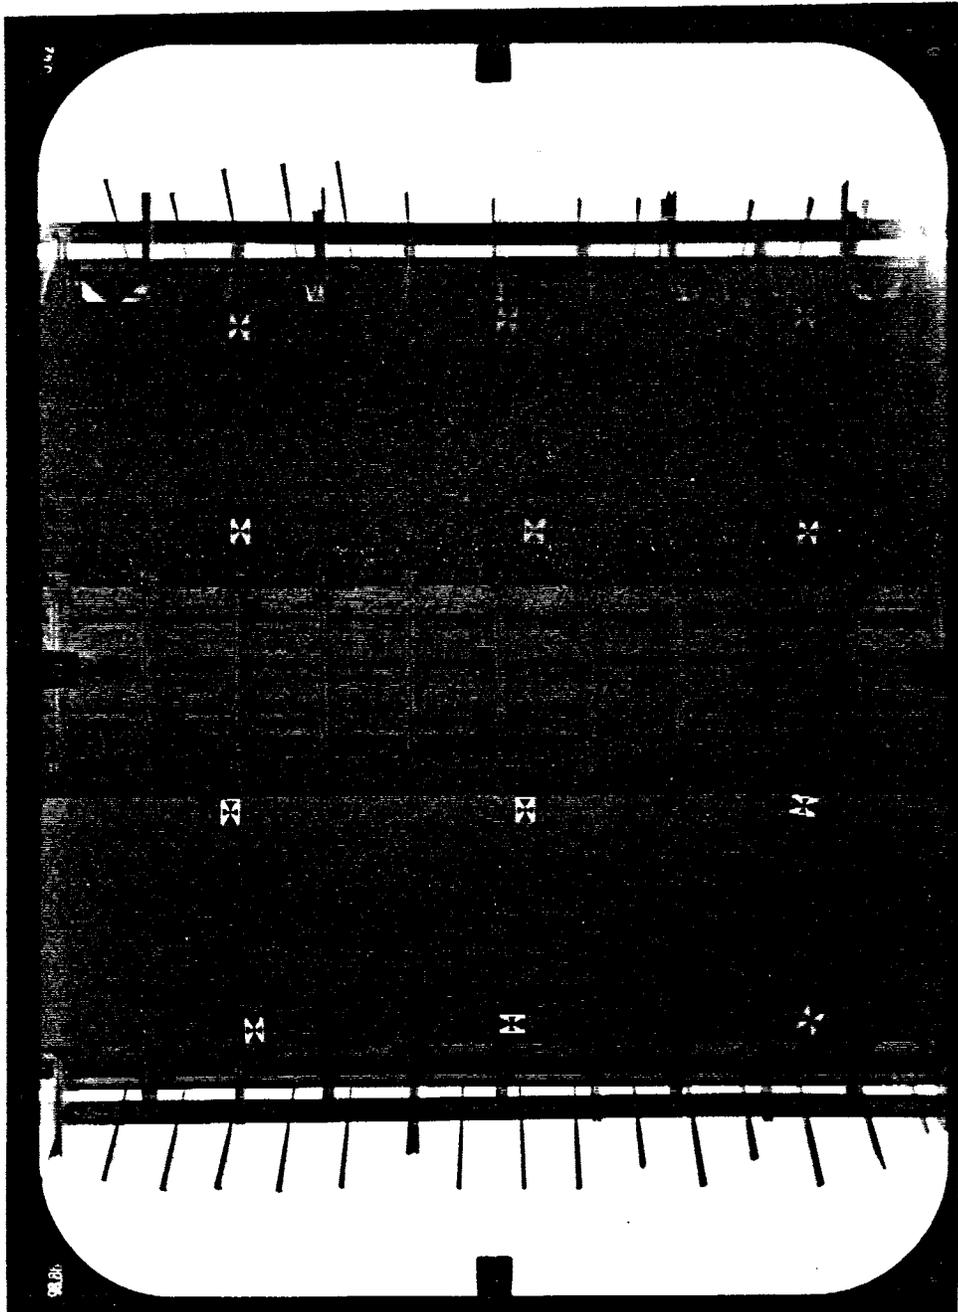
Underside of span 7 of Rte. 66 Metro box girder bridge prior to deck placement. Twelve targets for the photogrammetry are shown.
